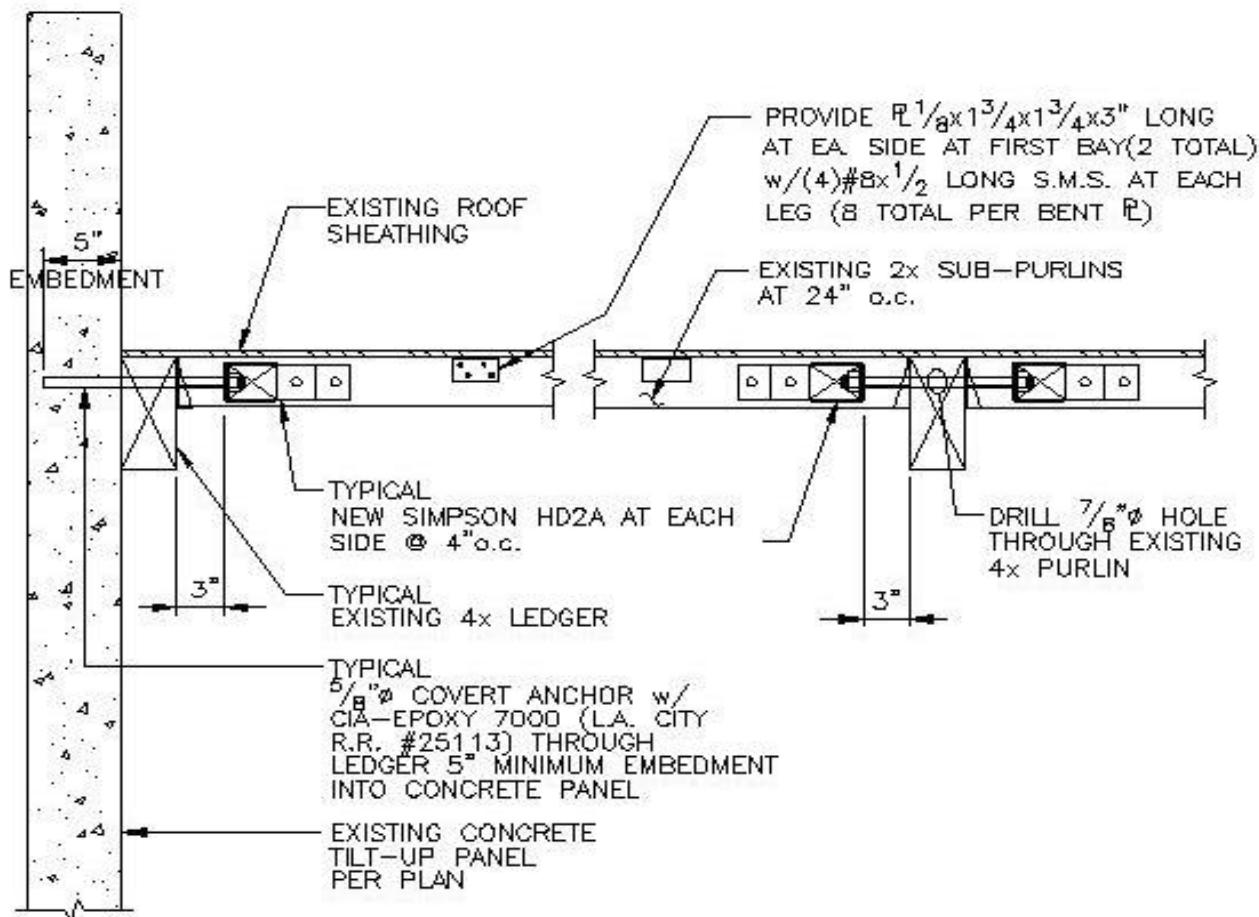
TYPICAL SUB-PURLIN TO EXISTING CONCRETE CONNECTION DETAIL
